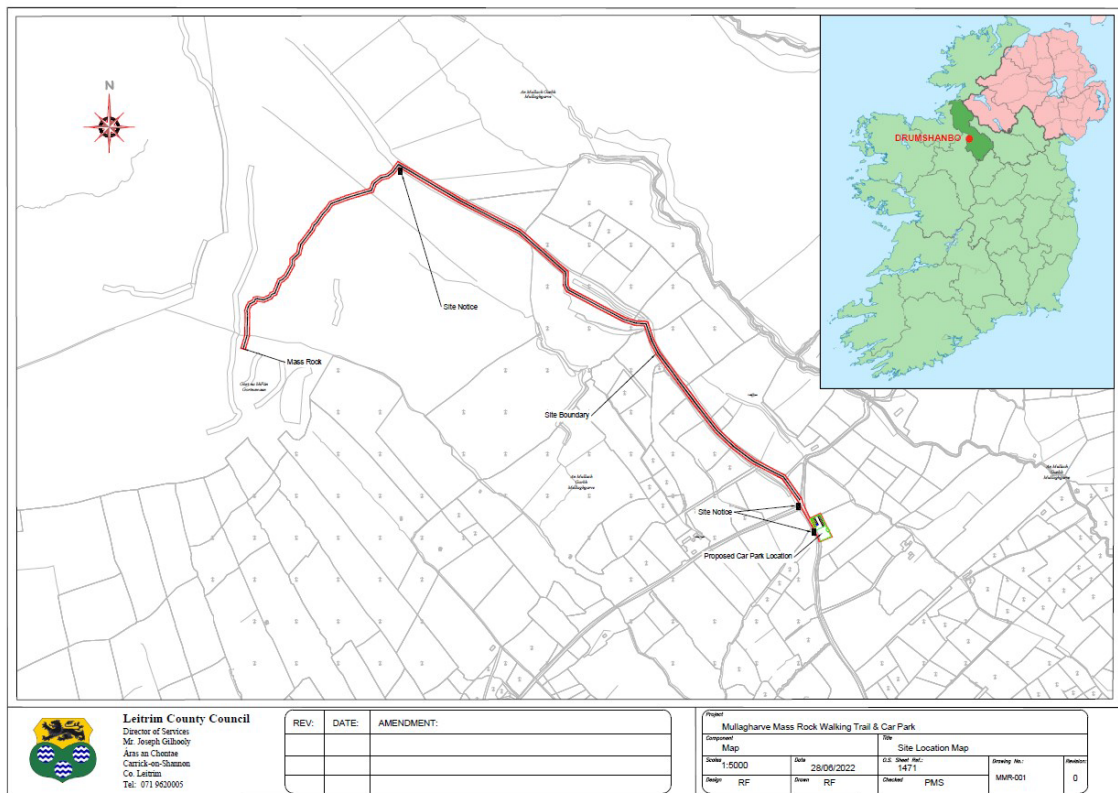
Site map of the proposed trail and carparking facilities at Mullaghgarve, Co. Leitrim.
